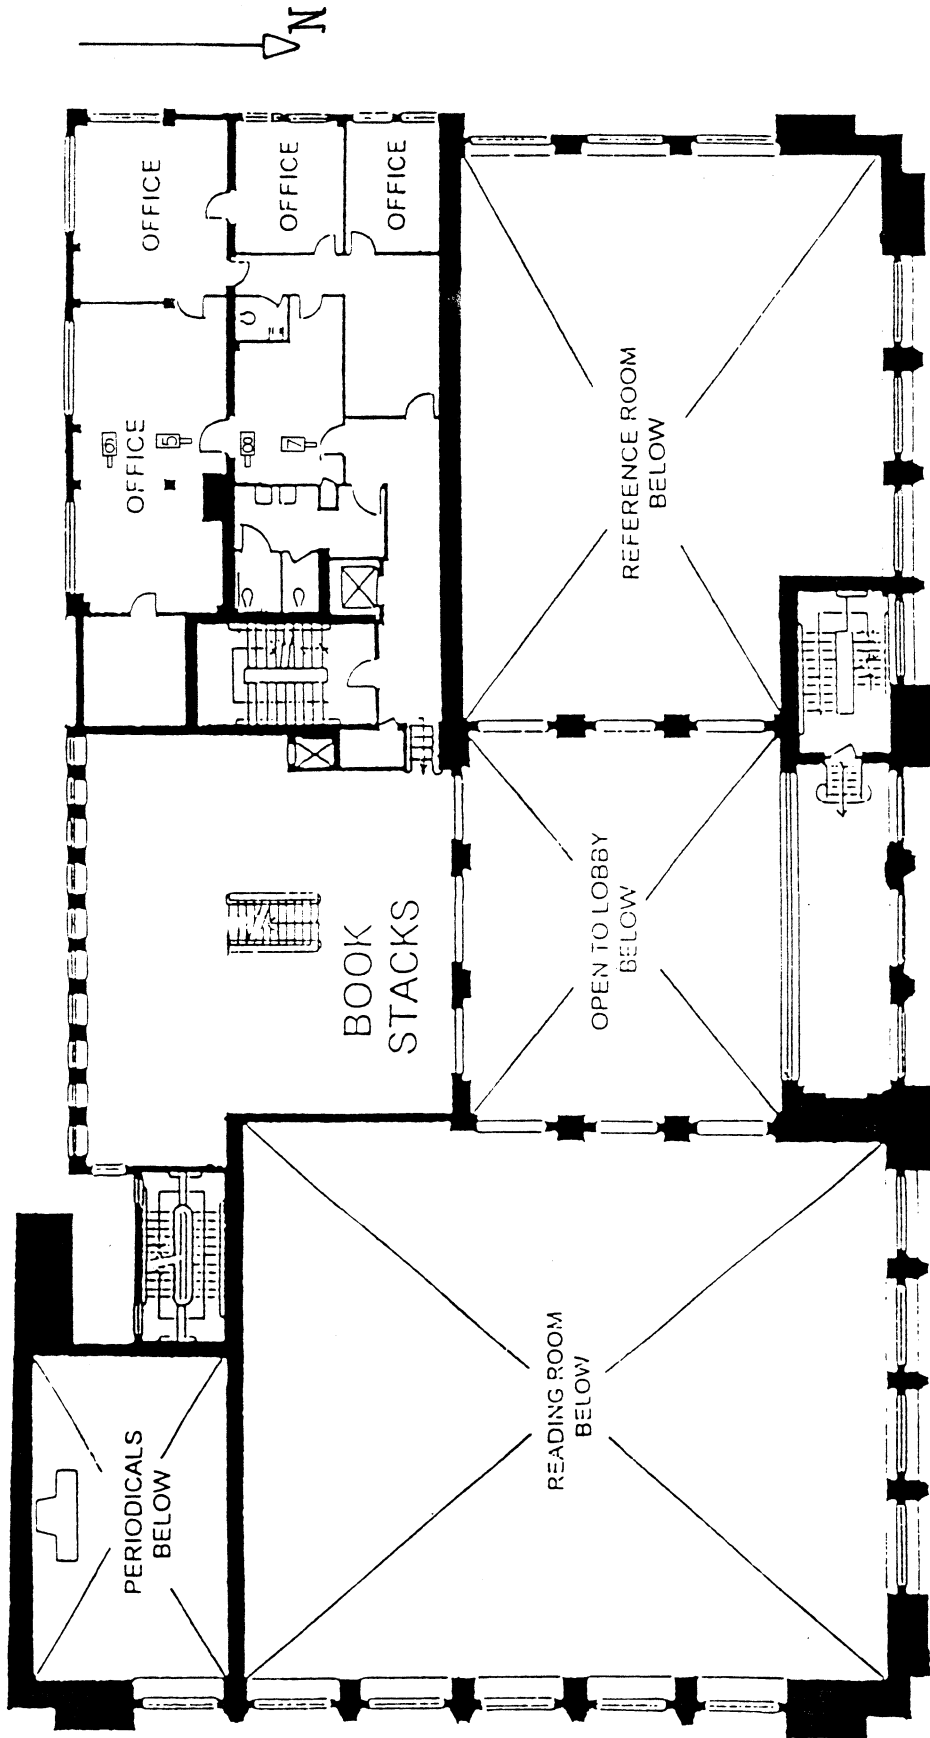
Test No. 7: Addition Test (3rd Floor)
